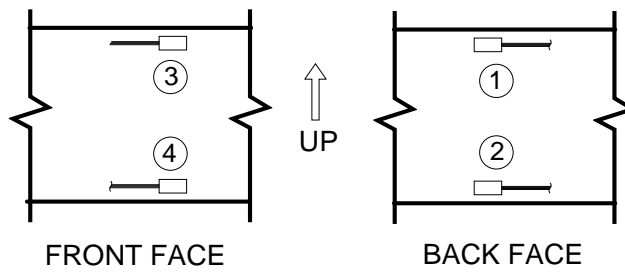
Strain Gage Locations and Numbering for Beam Strain-Gaged Sections at 1st Floor and 3rd Floor Beams
